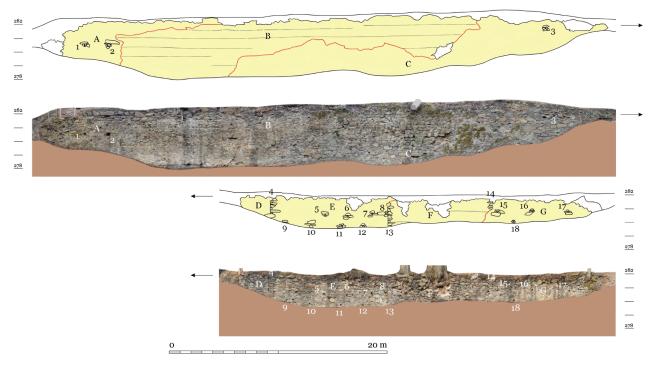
Photogrammetry and drawing of the southwestern wall of Zone III (external face): A-G – highlighted wall sections; 1–18 – identified architectural features (elaborated by P. Hlavenka, M. Sýkora)
